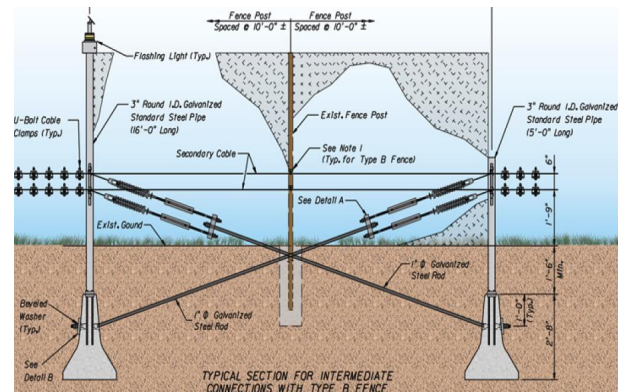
Dual foundation zones, which anchor contiguous sections of the cable barrier safety system (used with permission, American Consulting Professionals).
